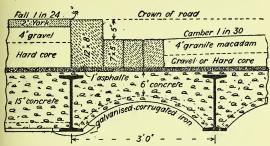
Part Section of Roadway of Steel Girder Bridge.
